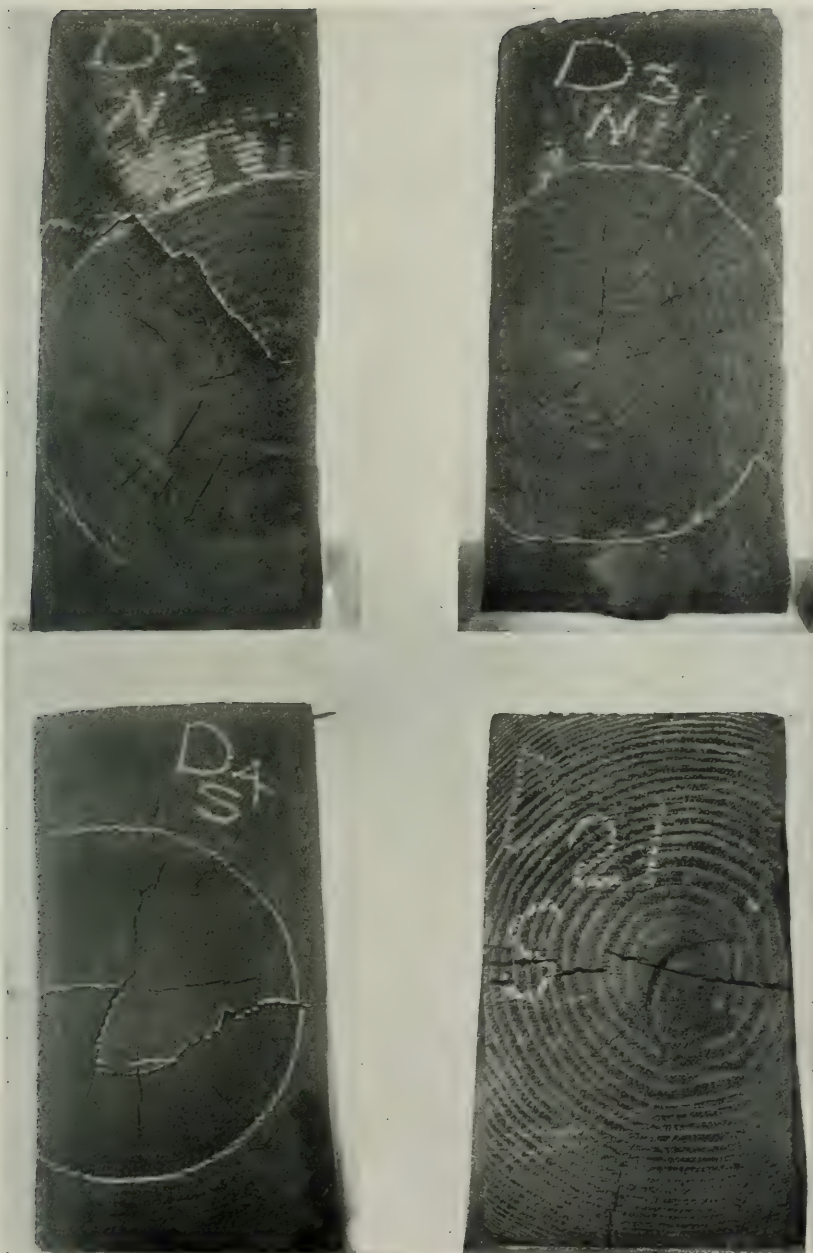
VIEWS OF ENDS OF BEAMS AFTER FAILURE.
